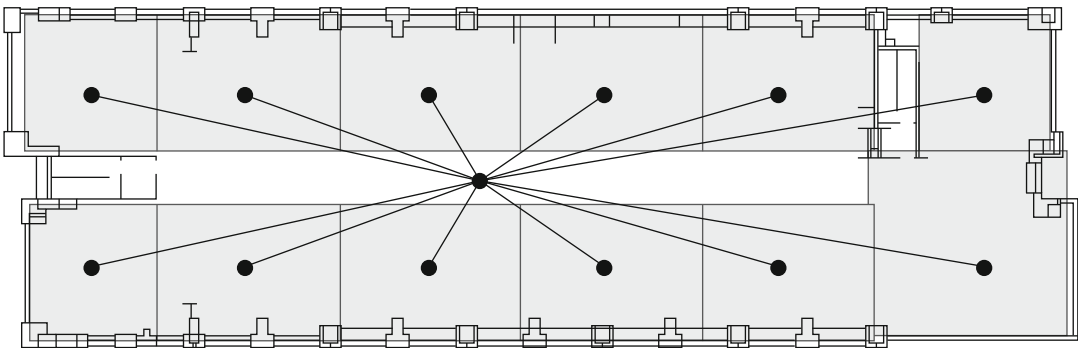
Floor plan of floors 11–20 (the office space)
